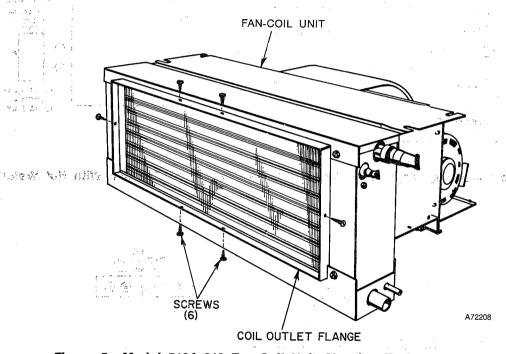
Model 513A-018 Fan-Coil Unit Showing Typical Mounting Screw Arrangement.
